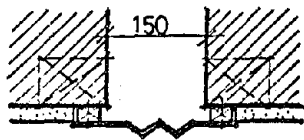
Flexible connection at aseismic joint, Tianjin Fr.Gh.Al. cover pulled out & dropped.
